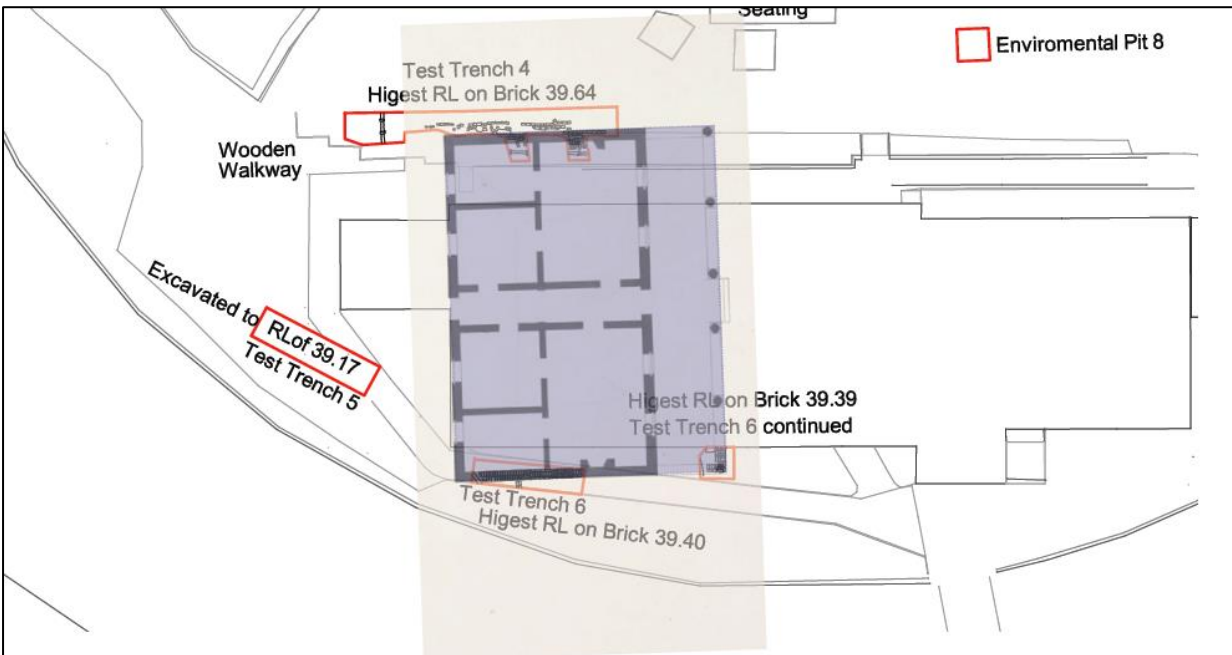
Overlay of Surgeons' Cottage Plan (1824) on archaeological survey plan.
